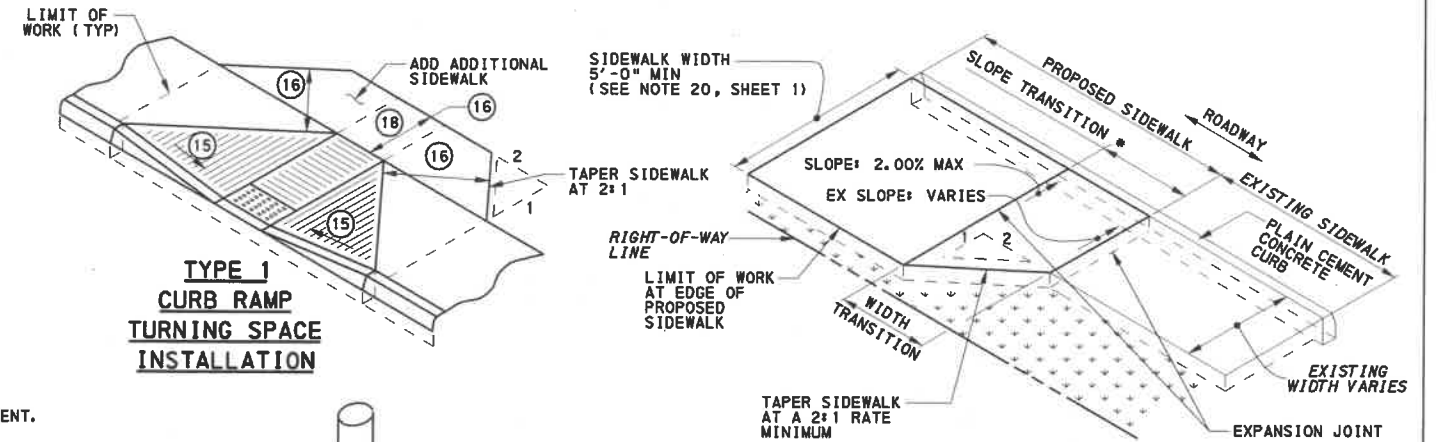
DETAIL ILLUSTRATES A TYPE 1 EXISTING RAMP REPLACED WITH A TYPE 2 RAMP. USE THIS DETAIL AS AN EXAMPLE TO REPLACE ANY RAMP WITH A DIFFERENT CURB RAMP TYPE.
